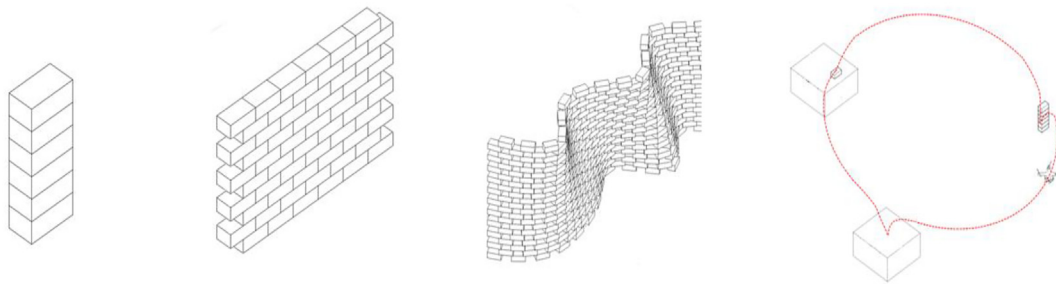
The three designed walls. From left to right: Wall 1; Wall 2; Wall 3; the landing position, brick deposit, construction plane with the wall being built, and the drone flight path. The brick dimension is constant; models are not to scale.
